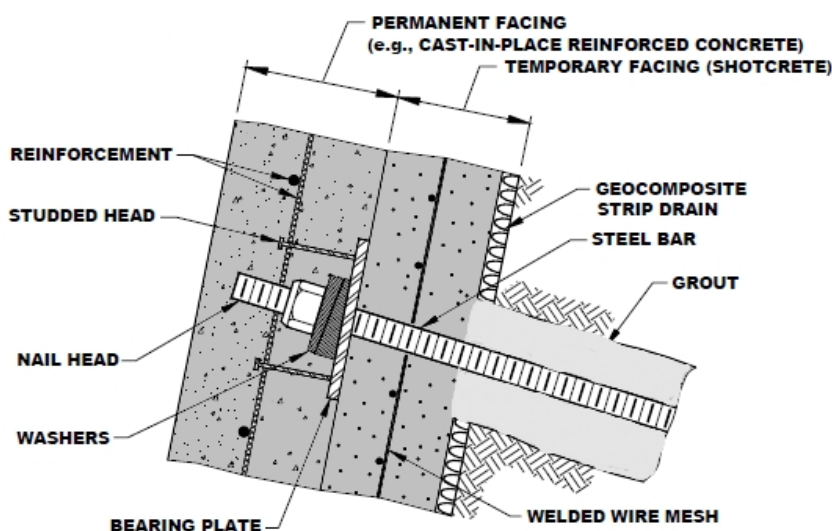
Sectional view of a retaining structure by nailing (Deep excavation reliable geoexpertise)
